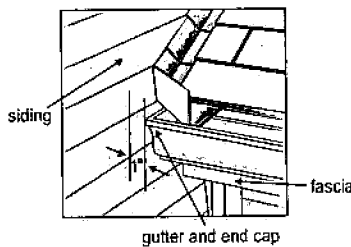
, Kickout Flashing To prevent water from dumping behind the siding and the end of the roof intersection, install a "kickout" of sufficient length and angle to direct the water running down the roof away from the siding.
